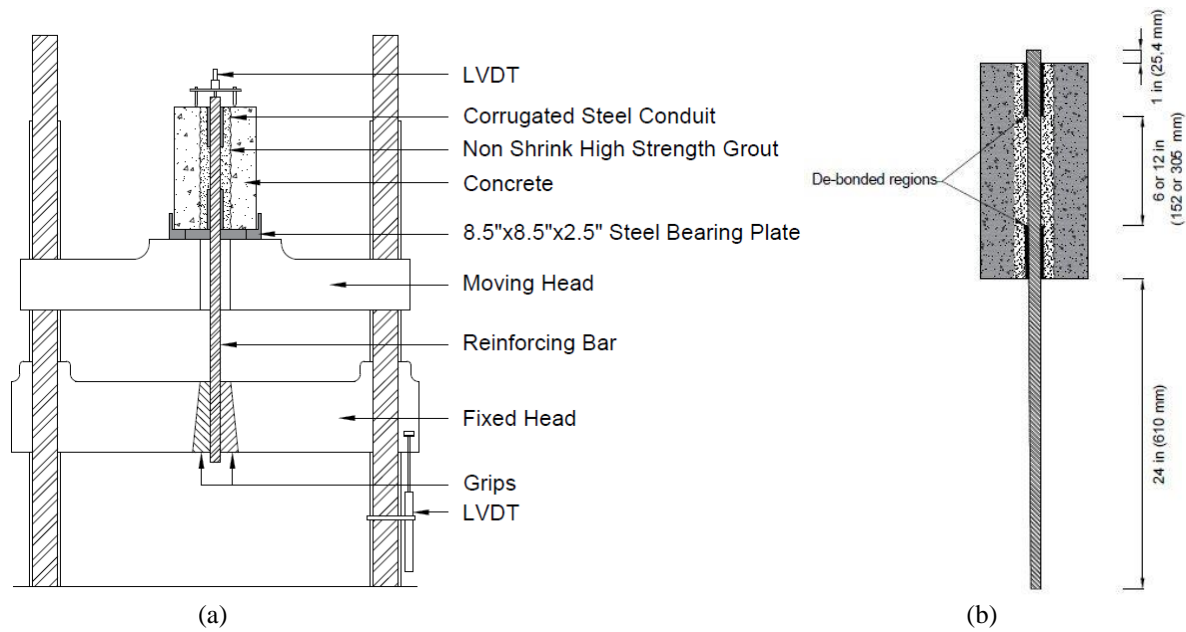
(a) Pull-out test rig; (b) Specimen dimensions
